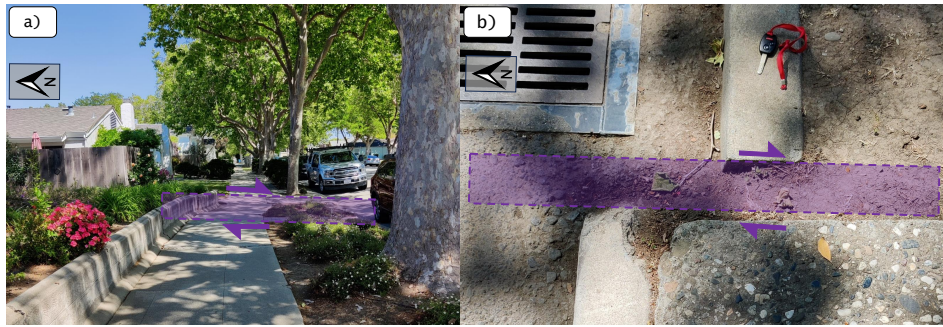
Offset pavement (a)) and curb (b)) along 6th Street, Hollister, CA by right lateral creep.
